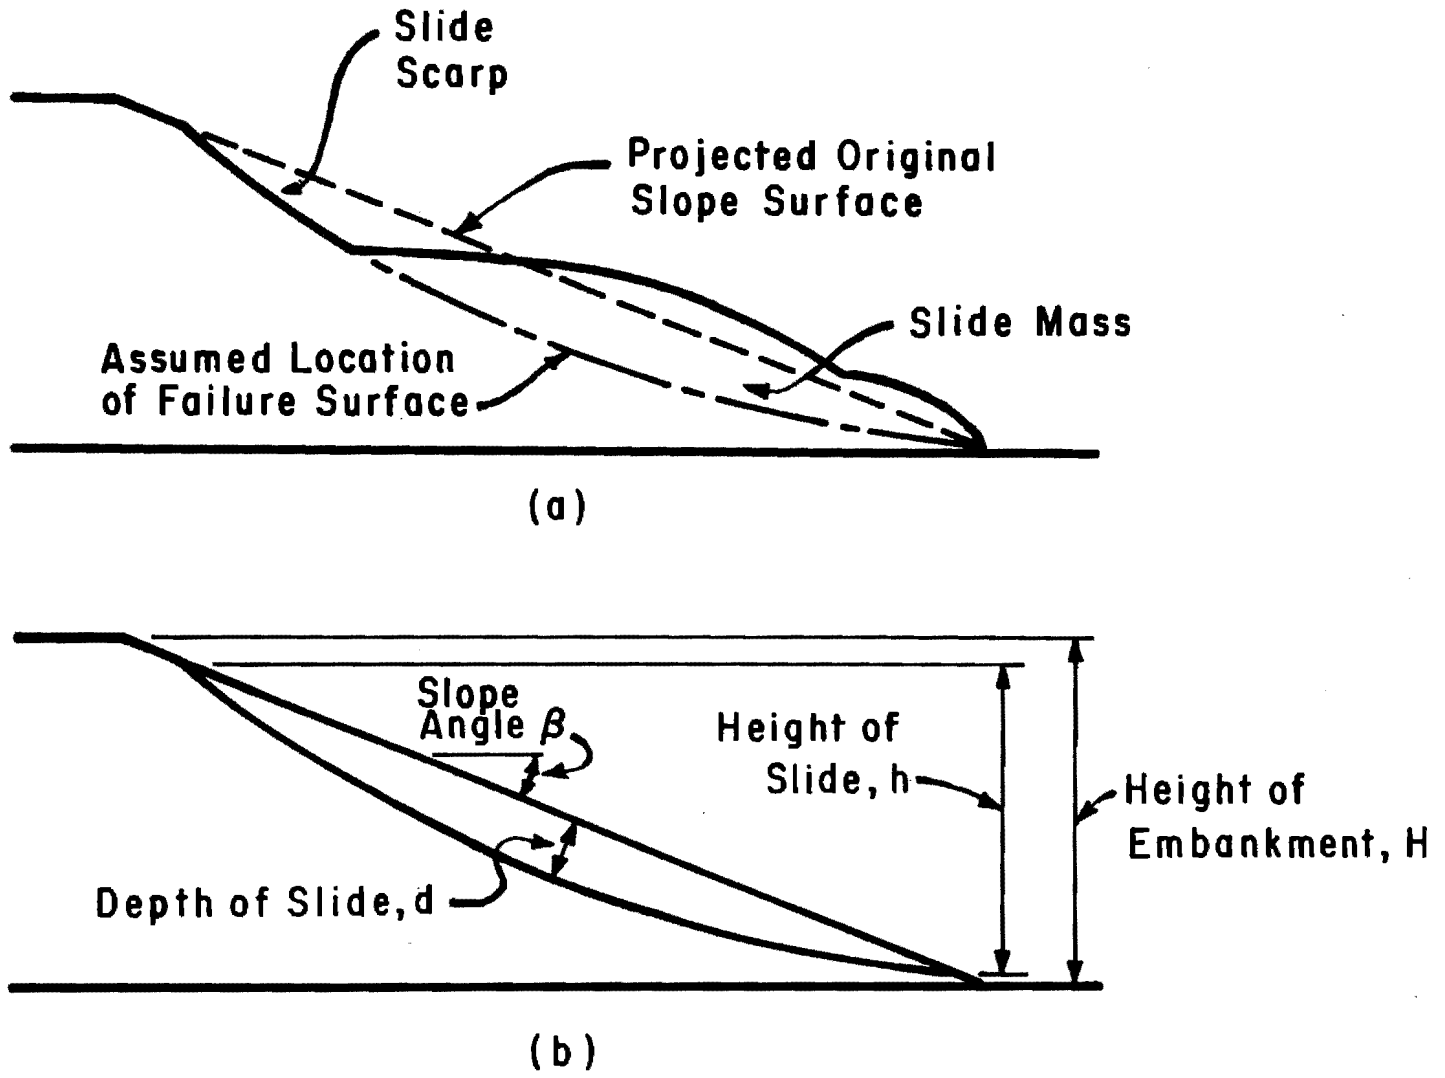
Cross-sections of embankment slope failure at IH 610 and Scott Street, District 12: (a) cross-section as viewed in field; (b) idealized cross-section and parameters used to define slope and slide geometry.
